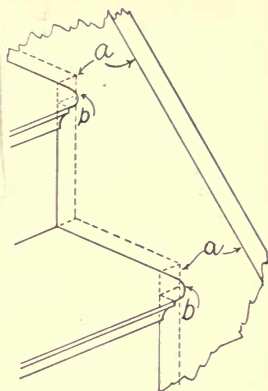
FITTING A SKIRTING BOARD; METHOD 1.
